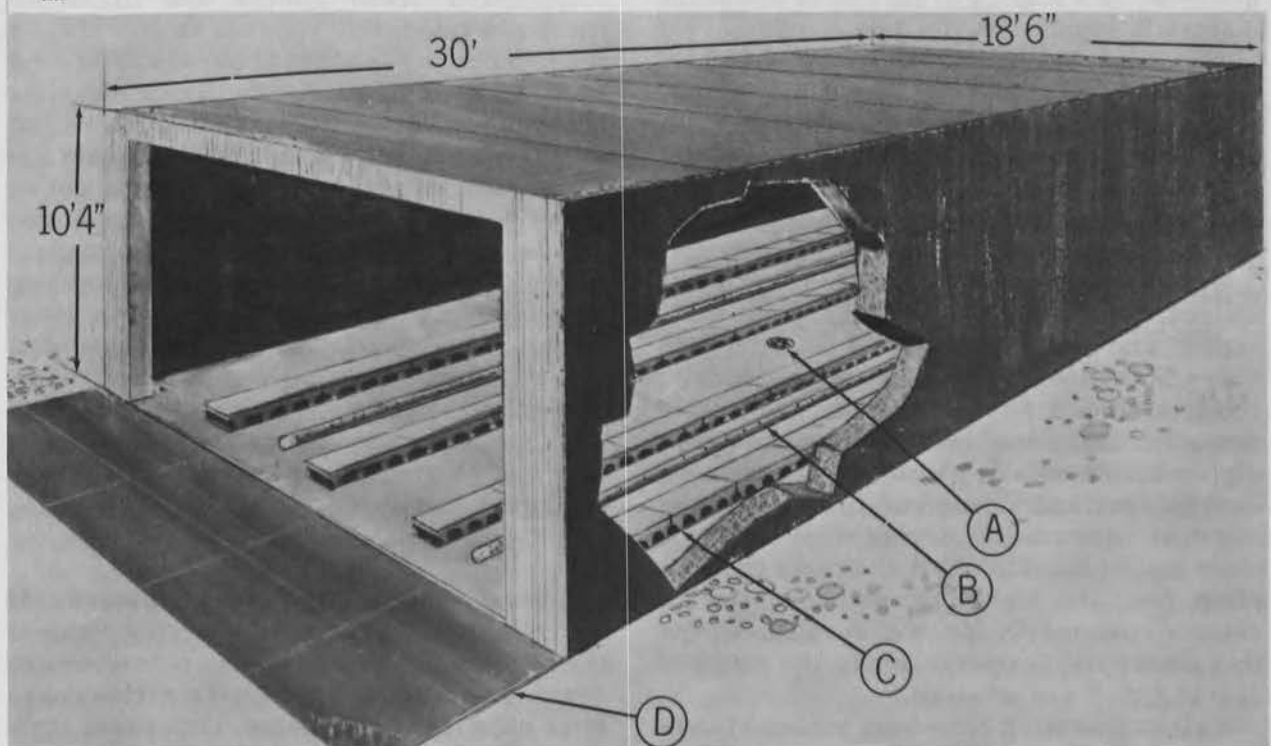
Steaming chamber constructed of concrete block and poured, reinforced concrete; A, Roof is poured concrete or prestressed concrete sections; B, apron or loading ramp; C, trough for perforated or imperforated steam pipes in water; and D, walls of concrete blocks or poured concrete.
